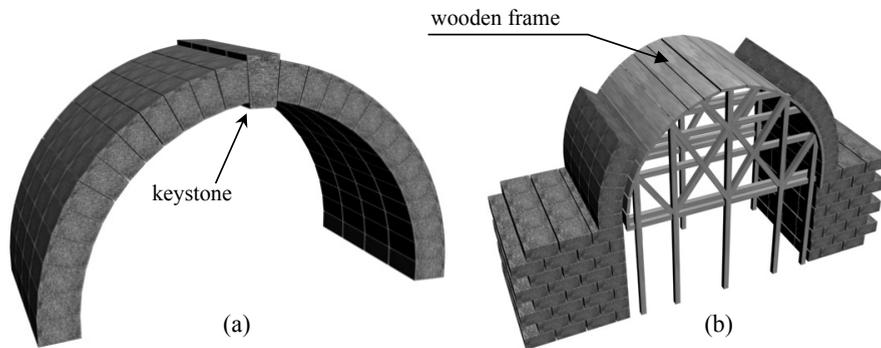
Some features and stages of a simple arch form, (a) the keystone, (b) constructing arch stones.
